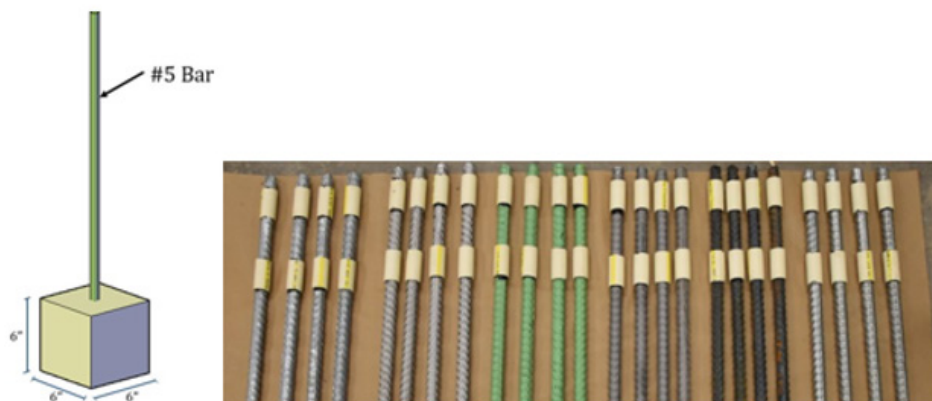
Pull-out test details (left: specimen details, and right: bar types).
